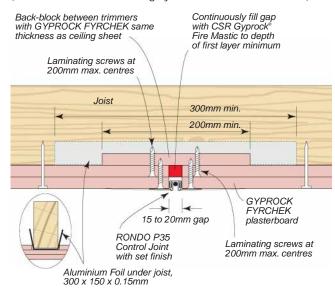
CONTROL JOINT PARALLEL TO TIMBER FRAMING – 3 LAYERS
